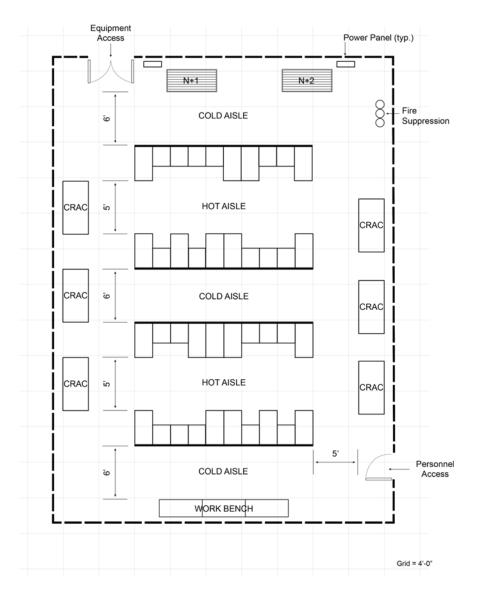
Typical Layout of Equipment Mounted in Racks
